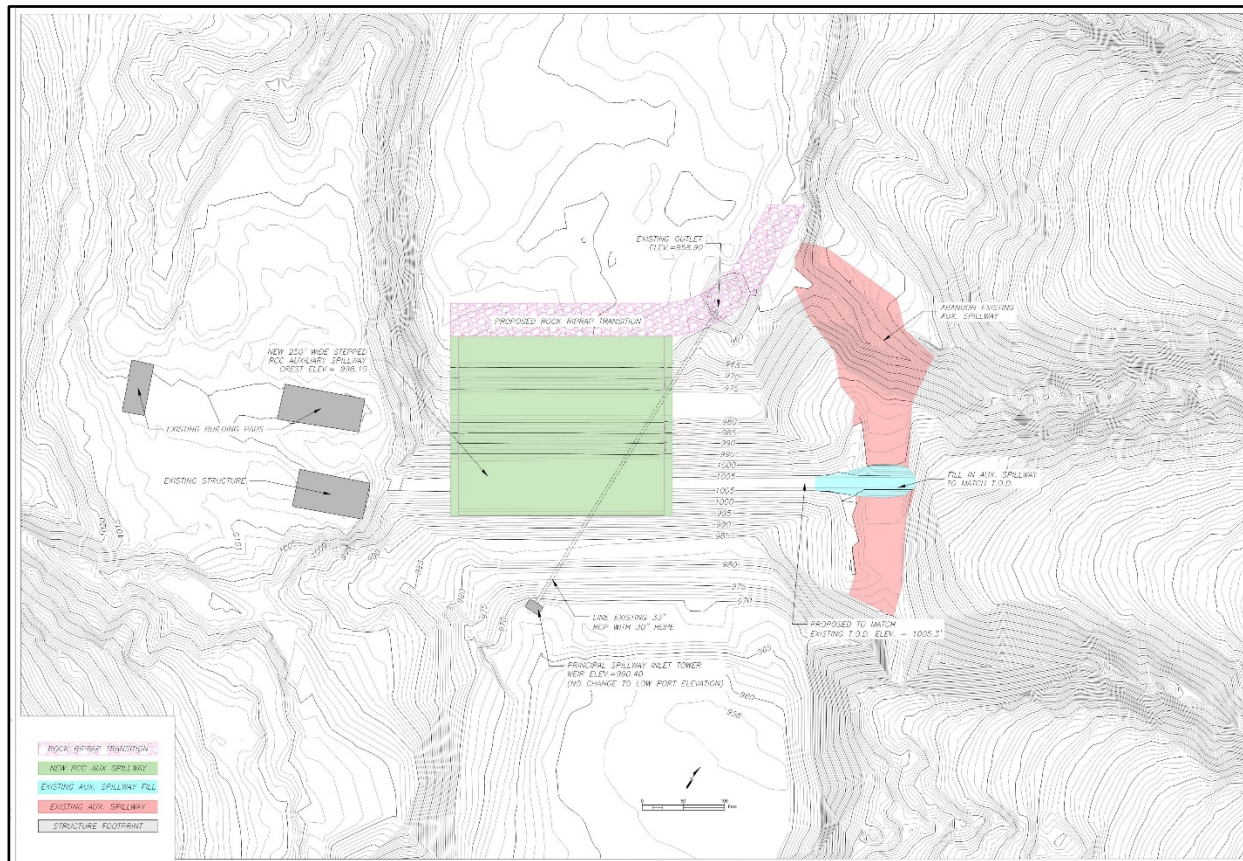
Plan view of a widened auxiliary spillway in Alternative 2.
